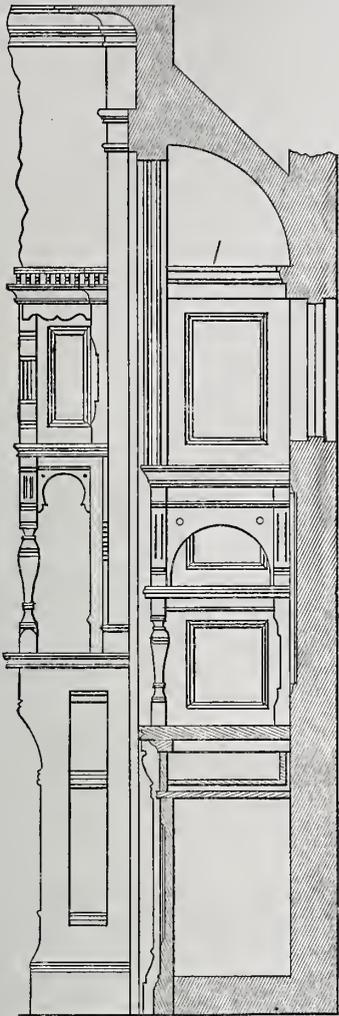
Section through Sideboard and End Elevation of Mantel.—Scale, 1/2 Inch to the Foot.
